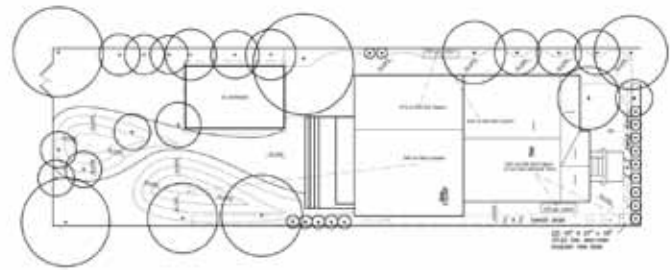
Site plan for roof runoff collection. All roof runoff is directed either to a cistern or to the rain garden.
